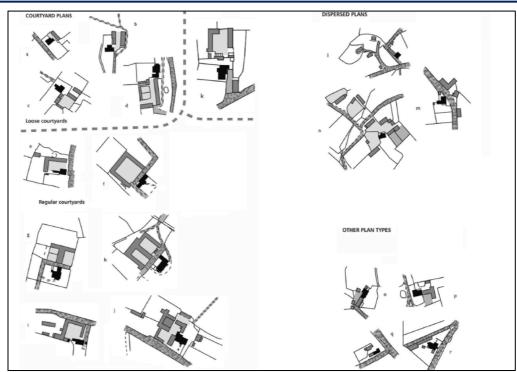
Variety of planforms of farmhouses and farm buildings in Kent (farmhouses in black, extract from AC 2014).
